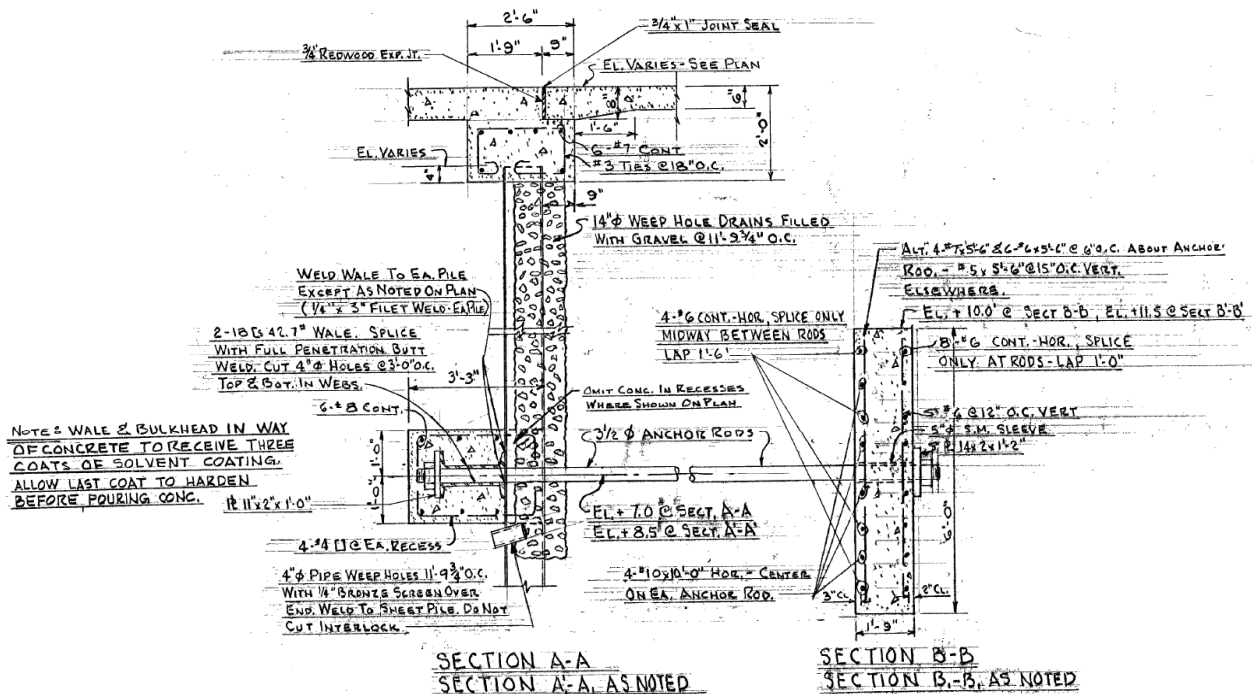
Cross-section of CD 26 through sheet piling bulkhead and anchor wall
